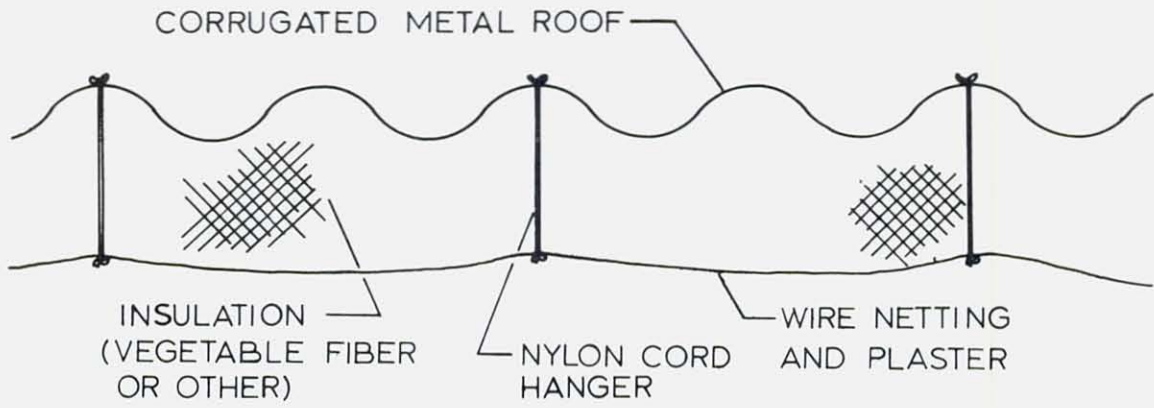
Cross section of suggested lightweight roof to replace mud roofs.
